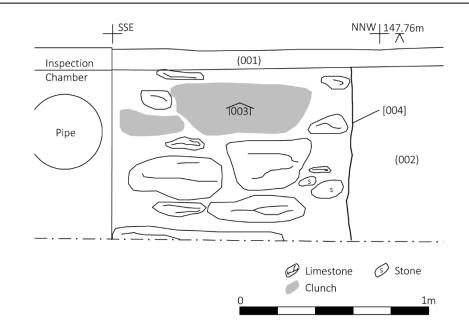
East facing section of service trench showing porch foundation [003] (scale 1:20)
